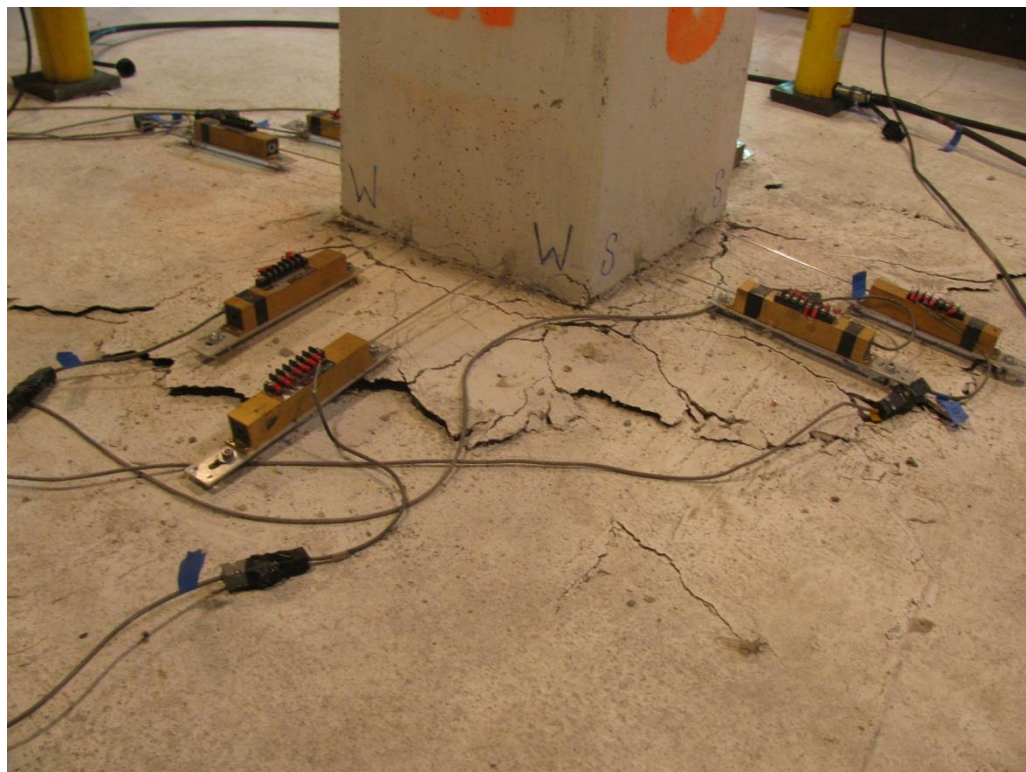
Specimen B1 – Connection Damage at 2.30% Drift, Point 4-5
